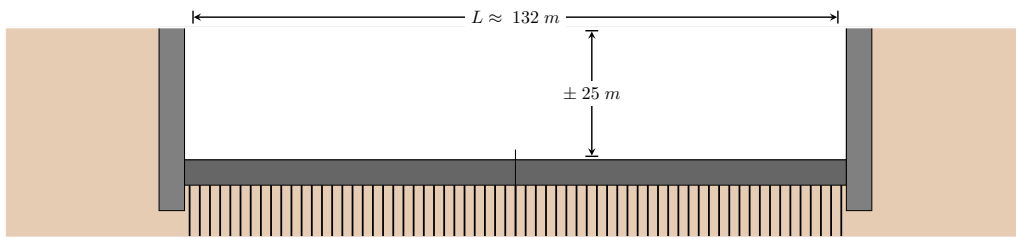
Schematisation of a combined structure out of diaphragm walls and an underwater concrete floor
